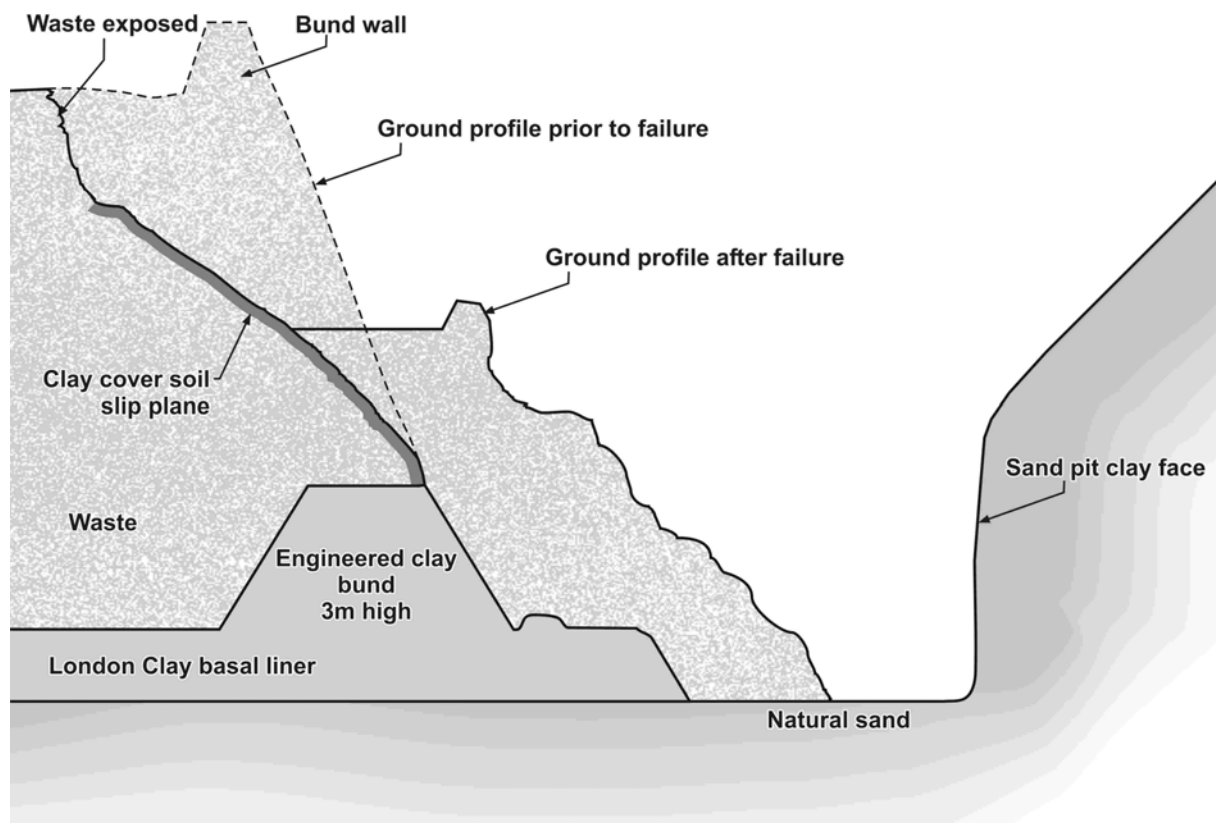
Sketch cross-section showing the pre- and post-failure slope profiles
